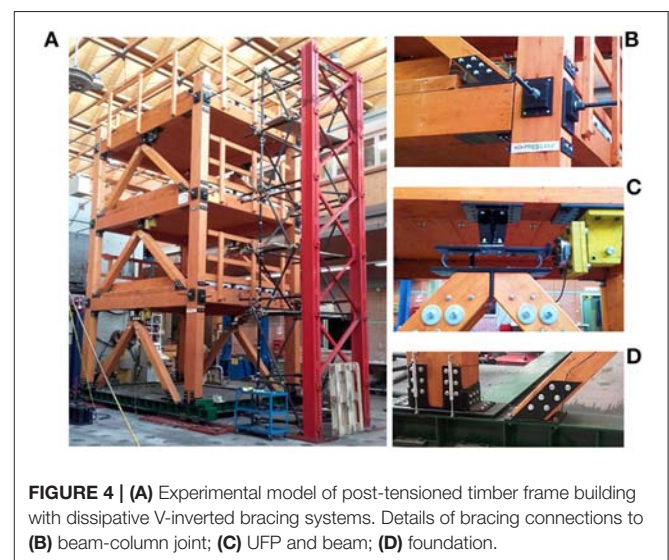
| (A) Experimental model of post-tensioned timber frame building with dissipative V-inverted bracing systems. Details of bracing connections to (B) beam-column joint; (C) UFP and beam; (D) foundation.
